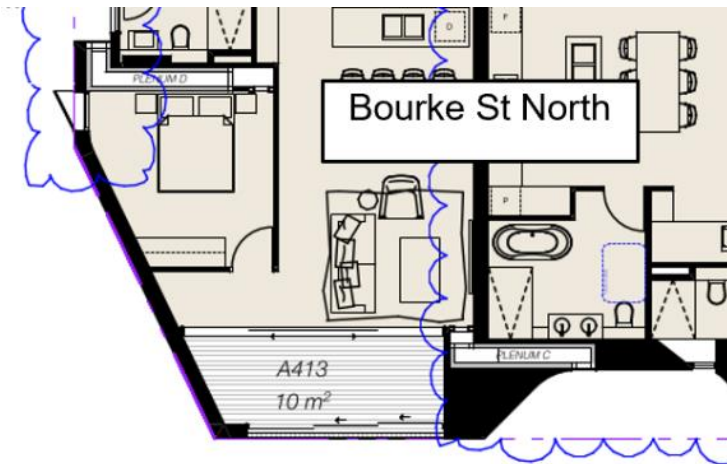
Extract from Bourke Street North Building, showing separate plenum types that are proposed to be installed to mitigate traffic generated noise and allow for air flow within apartments
